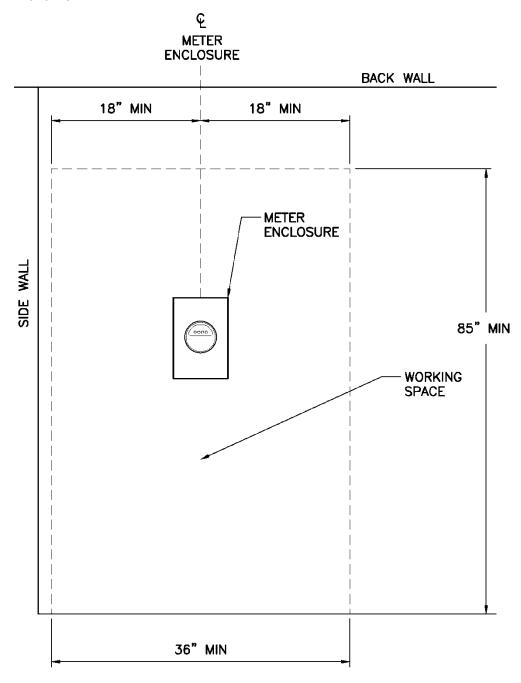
Working Space Requirements for Single Meter Installations, Projection
